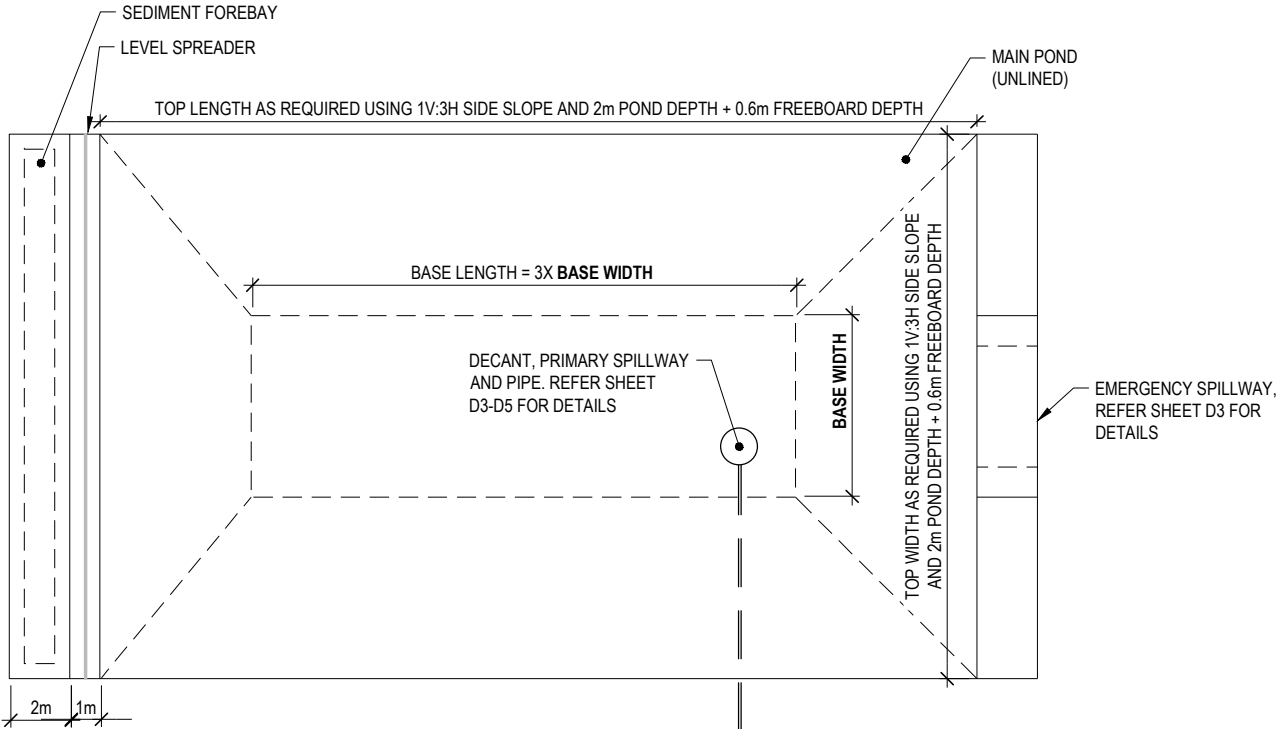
PLAN VIEW OF SEDIMENT RETENTION POND
